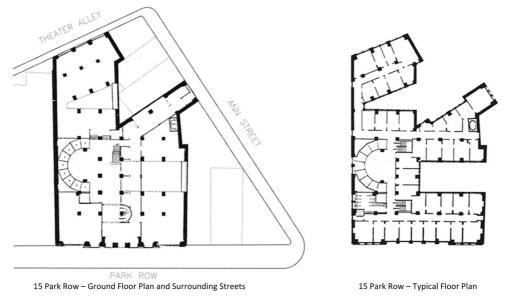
15 Park Row - Ground Floor Plan and Surrounding Streets, 15 Park Row - Typical Floor Plan.
